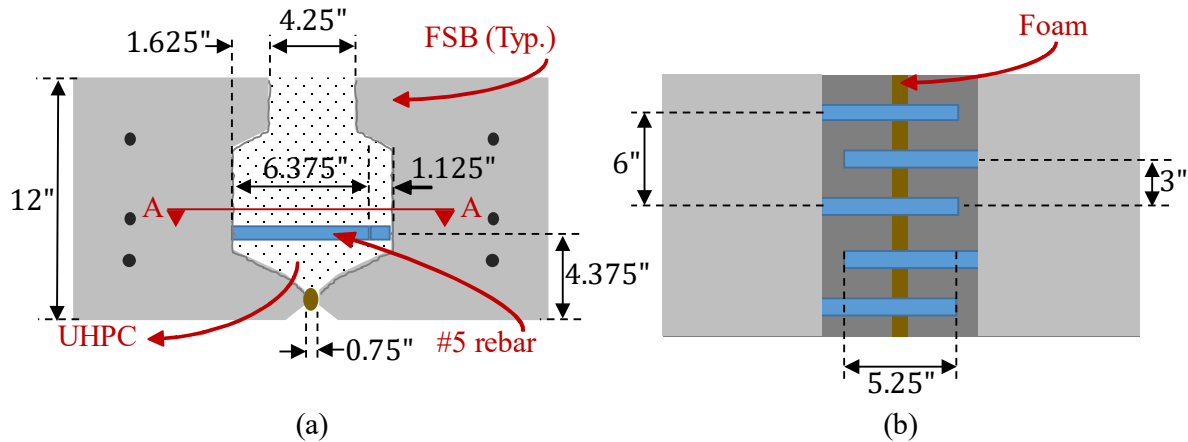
Modified FSB joint geometry: (a) joint cross section and (b) section A-A
